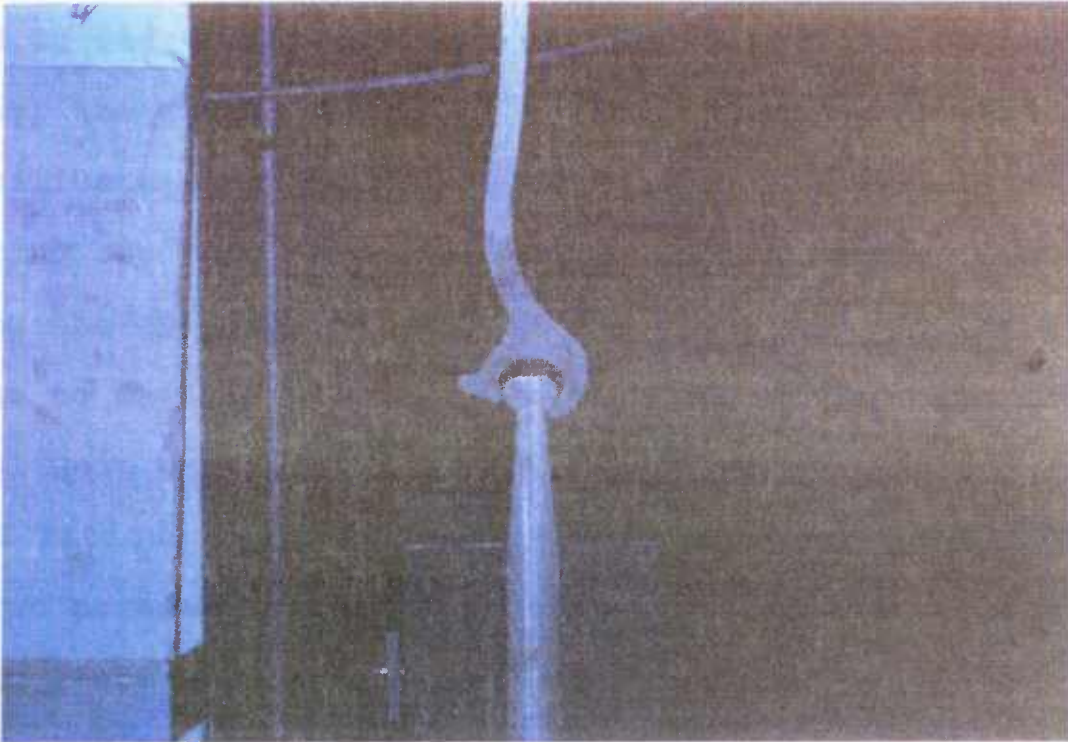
Failure of transition specimen at grips indicating interlock opening
